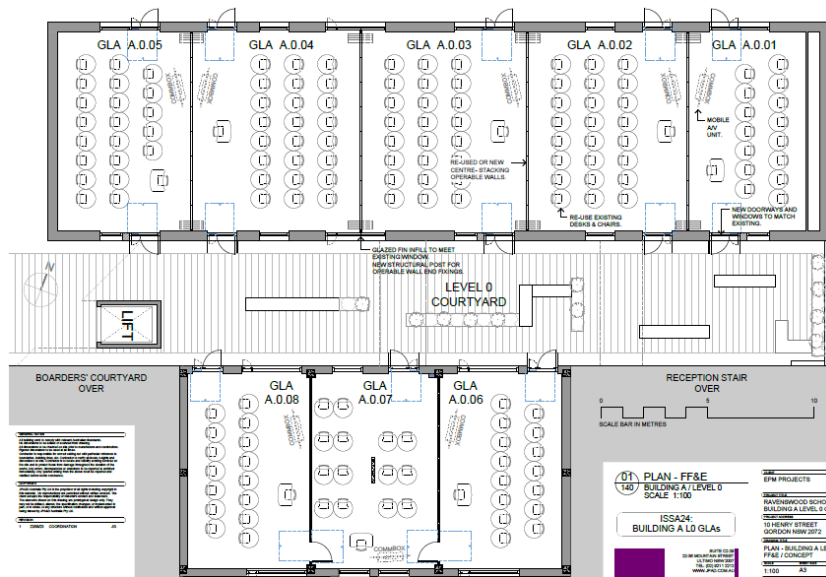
Classroom layout Building A Ground level (source: JPA&D)
